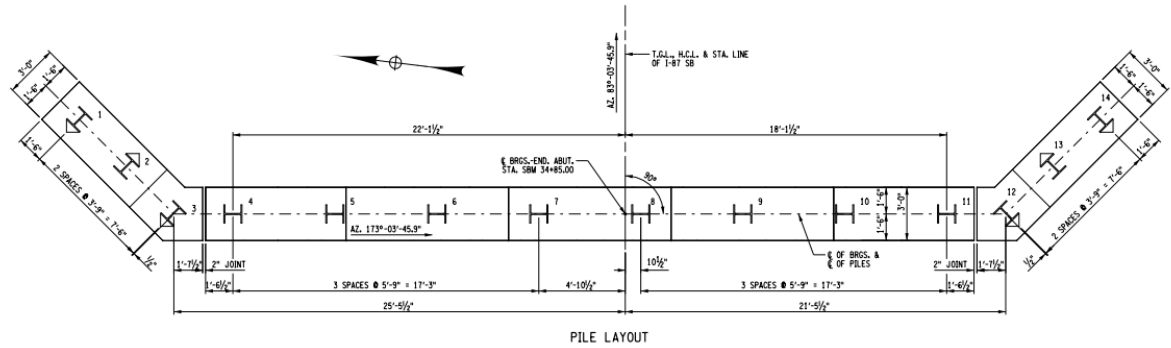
Piles layout of I-87 S.B. over Meigsville Rd.
